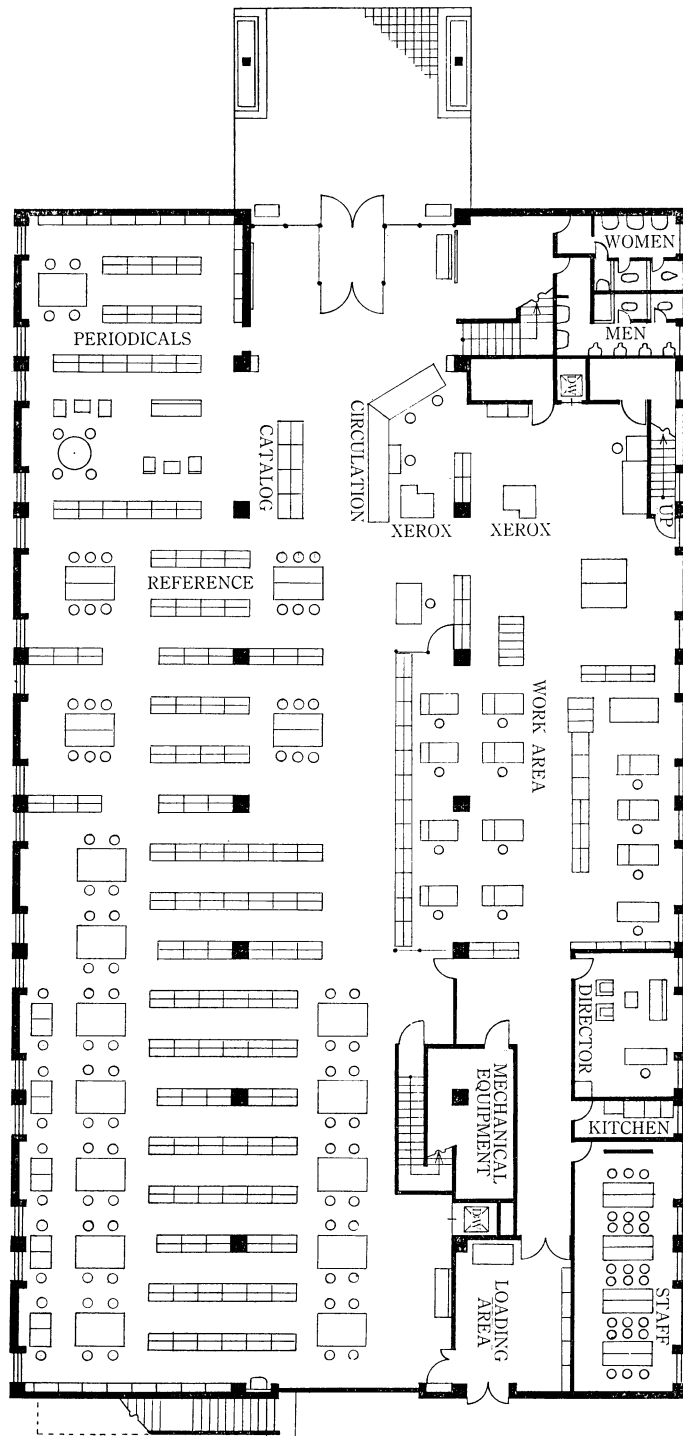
Floor plan of the Matsushita Memorial Library: First Floor.
